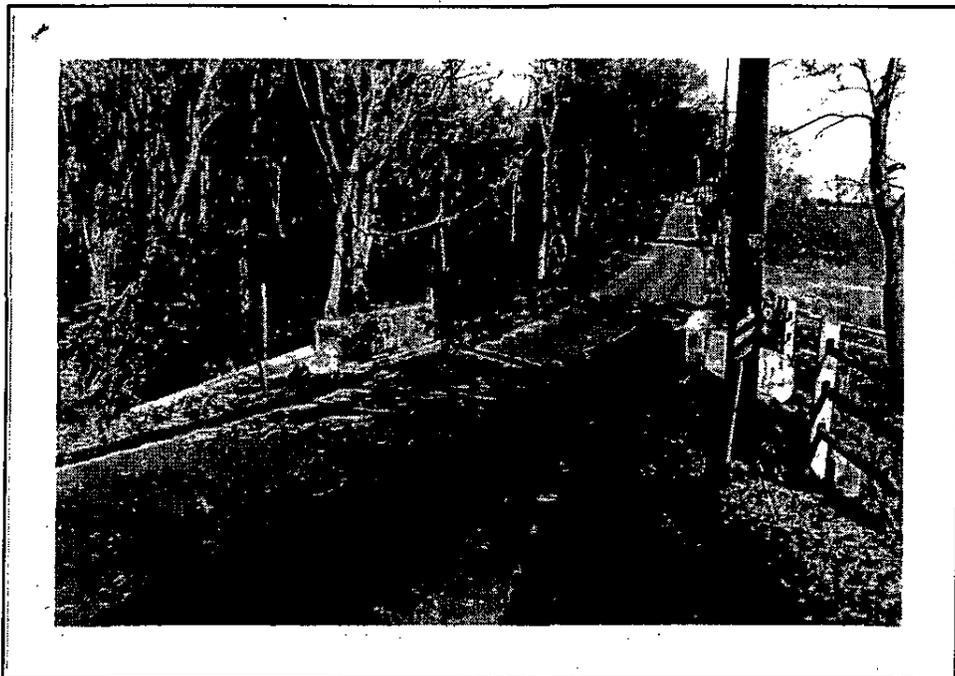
Bridge 174 (N-13787), Southwest Approach, Looking Northeast
